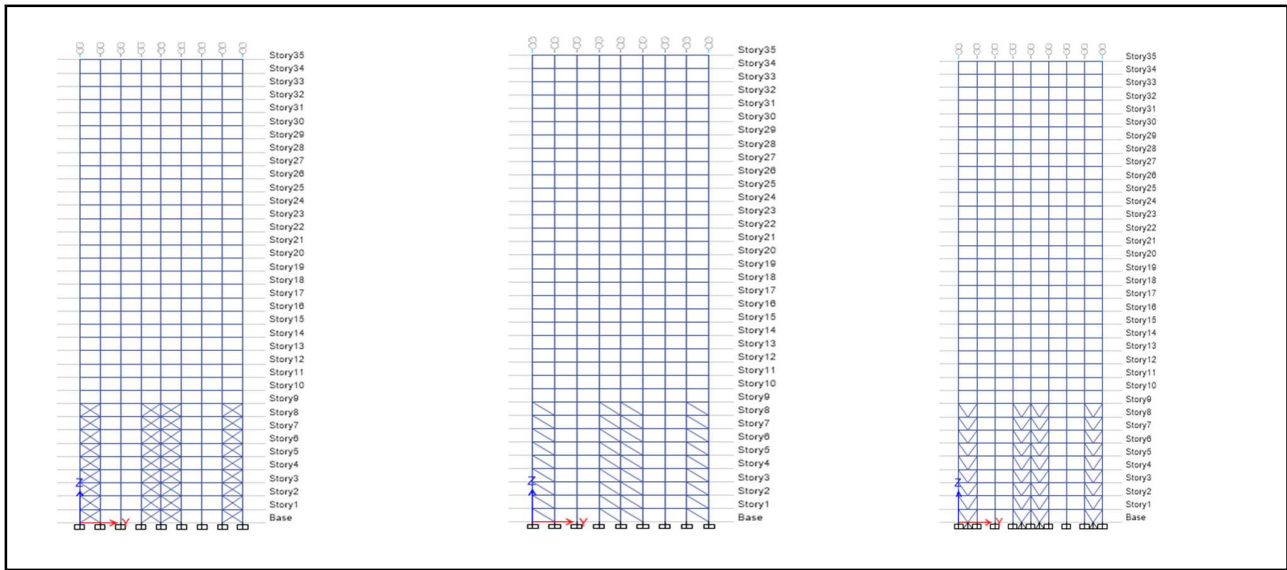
Elevation of X type, Diagonal eccentric backward, V shape of bracing systems
